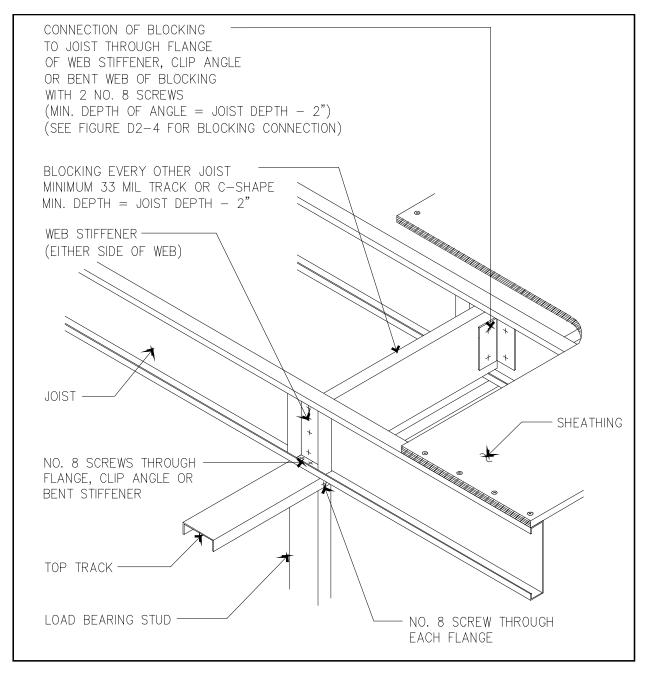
Continuous Span Joist Supported on an Interior Structural Wall
